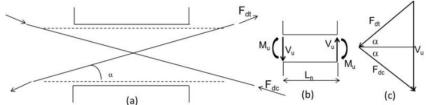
Model of diagonal coupling beam (a) configuration of diagonal bars
